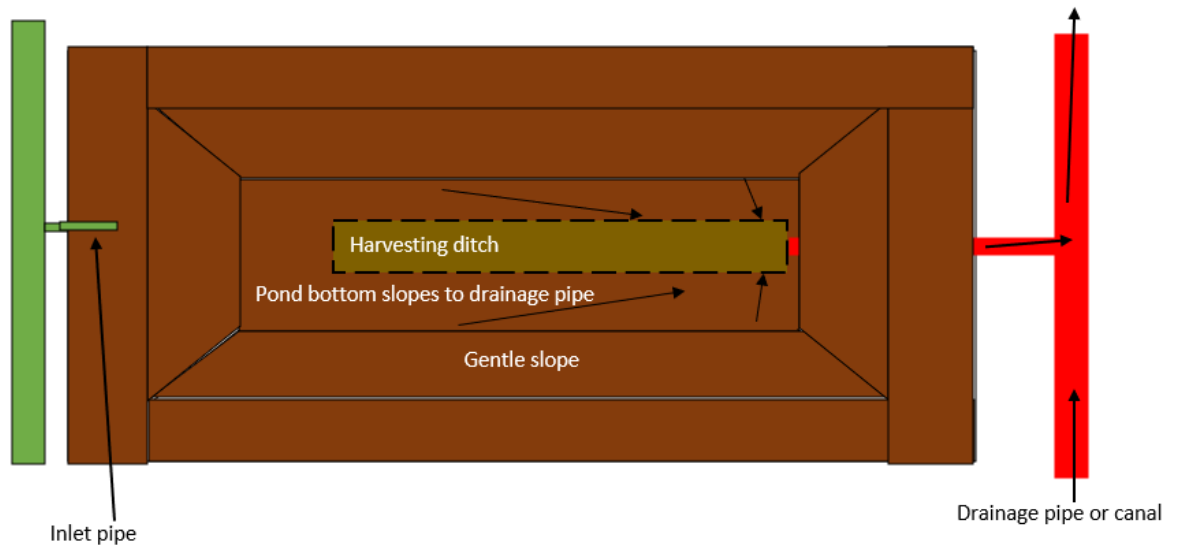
pond layout with inlet, outlet and harvesting ditch structures
